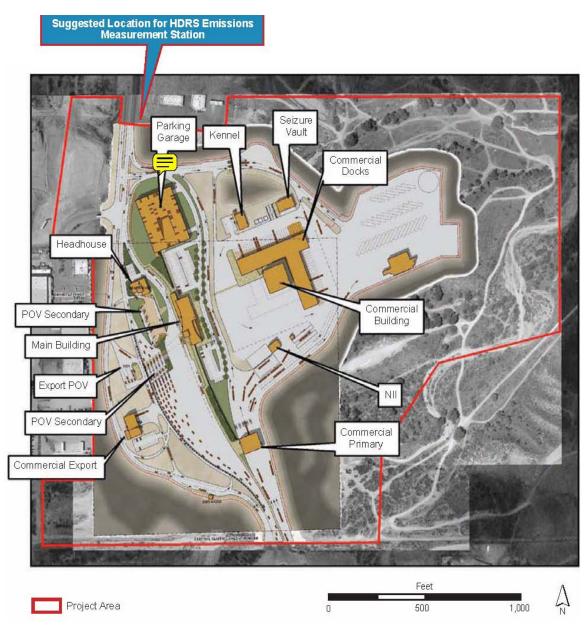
Illustration of Proposed Expansion Layout for Nogales-Mariposa LPOE (September 2007)¹⁸
